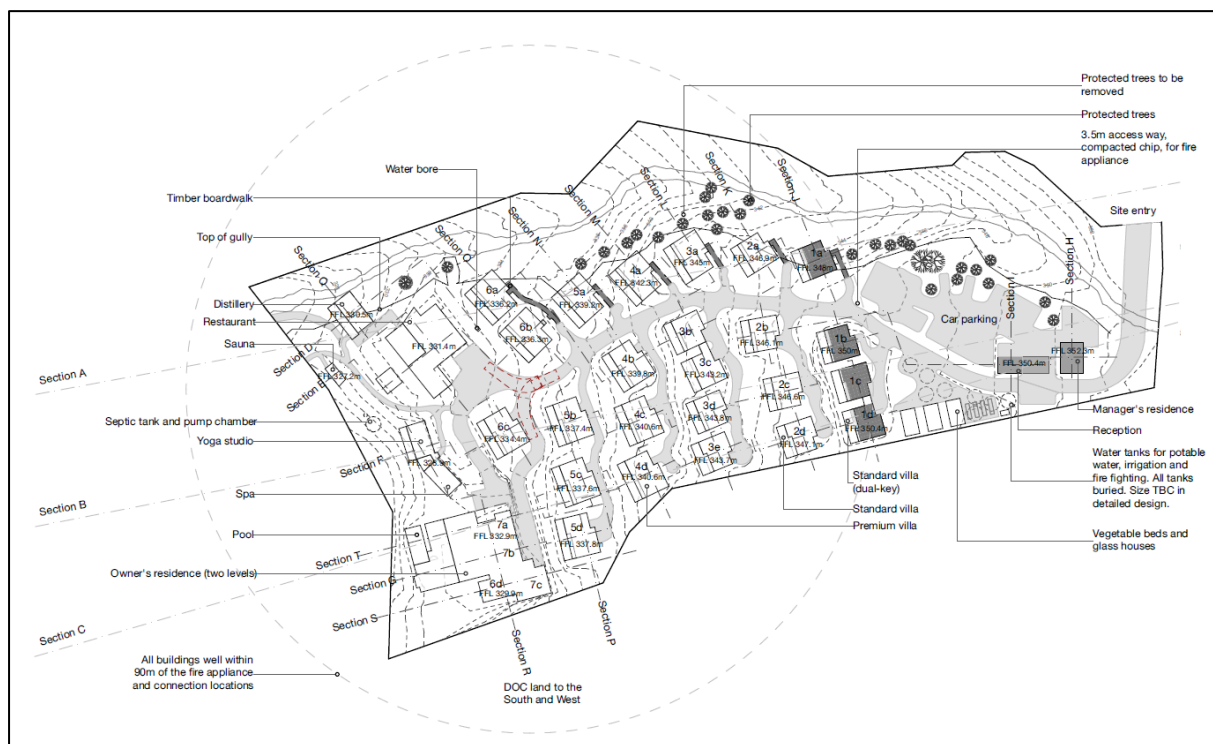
Proposed Site Layout. Image Source: Design Base Architecture
